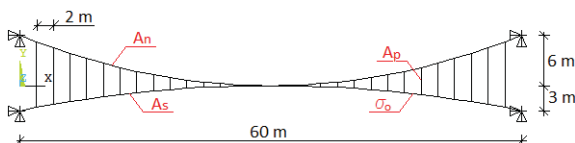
Numerical model of prestressed cable trusses of pedestrian suspension bridge
